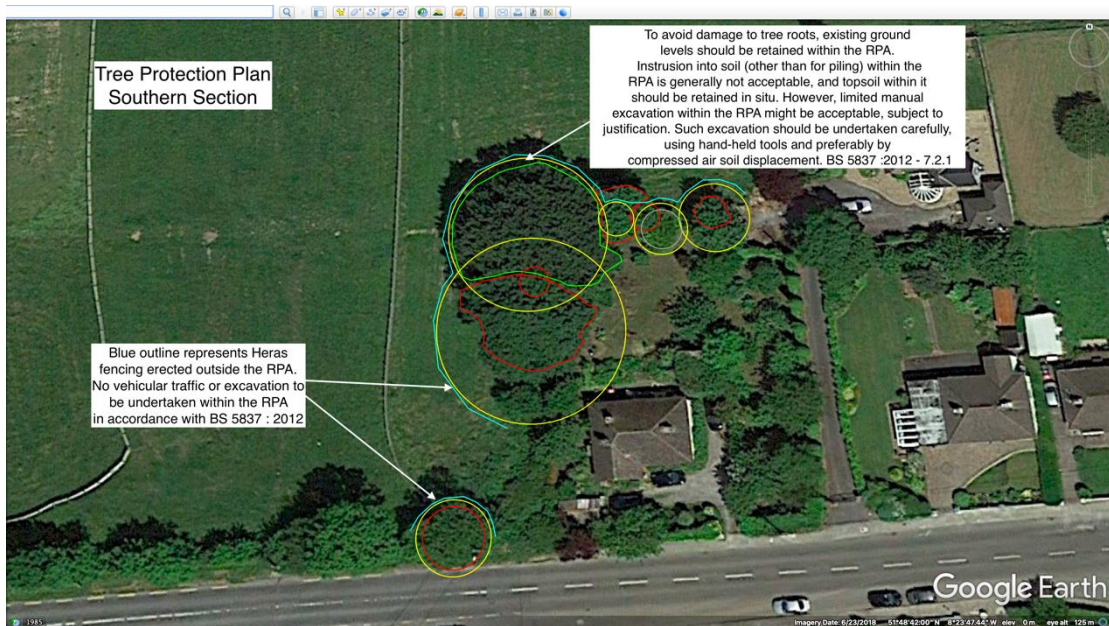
Photo of the Tree Protection Plan Southern section of the site
